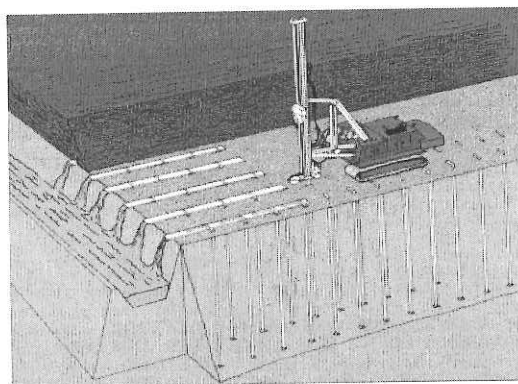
Vertical drain installations with horizontal strip drain.[3]
